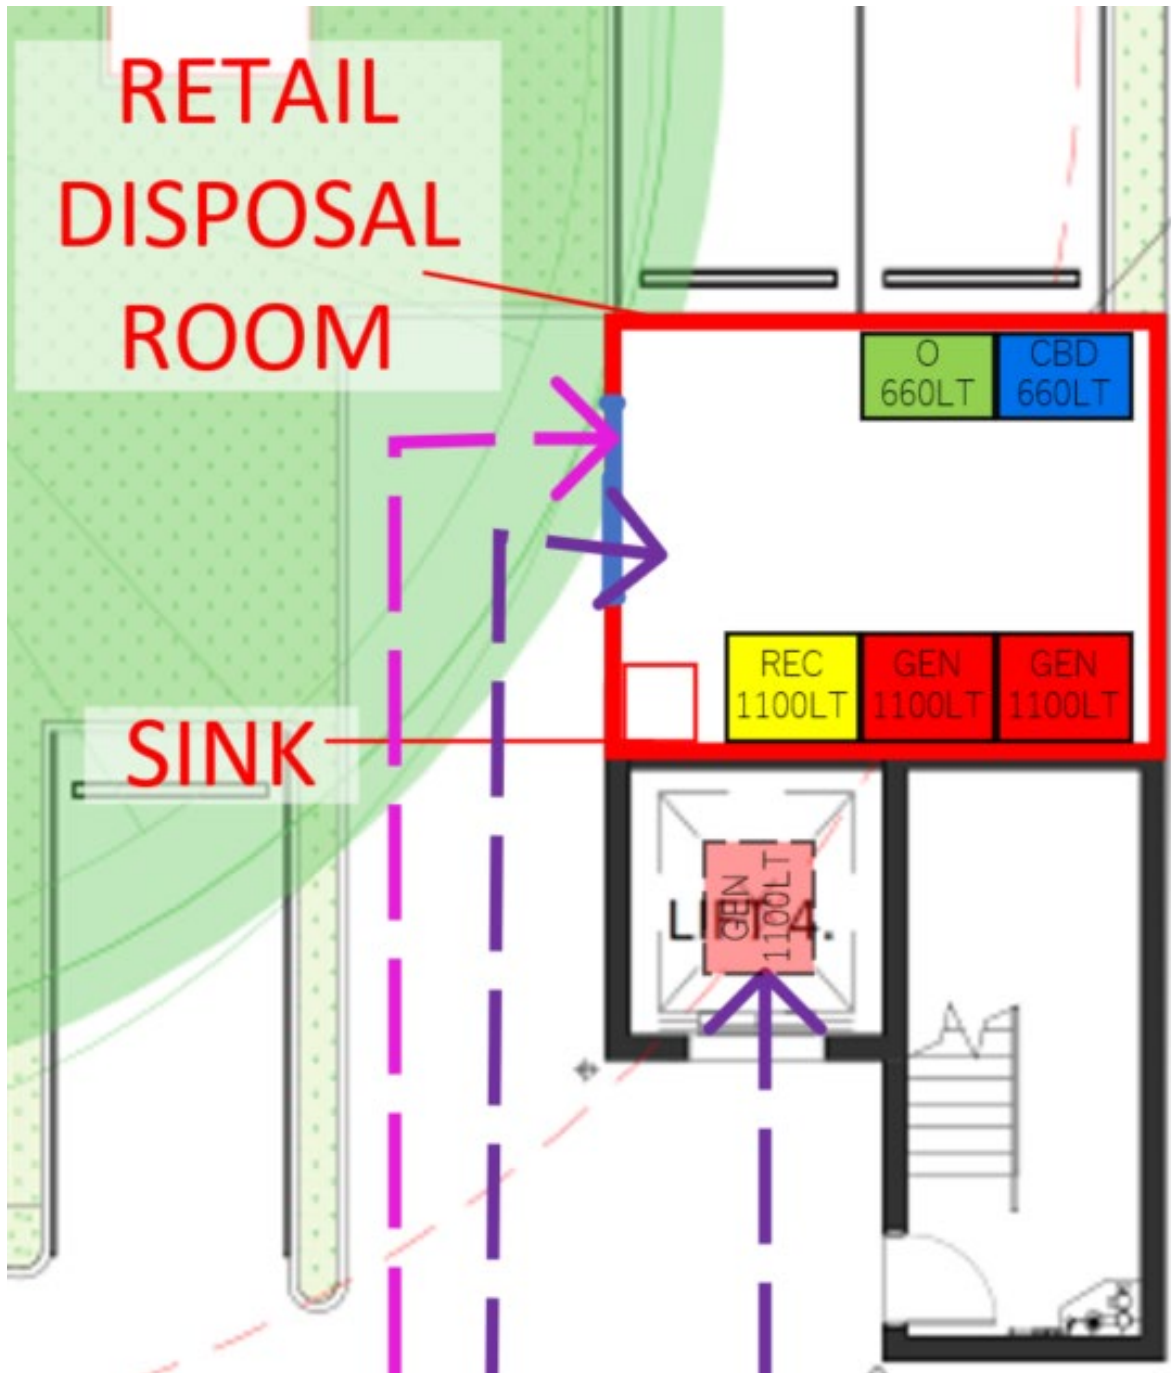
Detailed view of the Retail Disposal Room on Ground Floor
